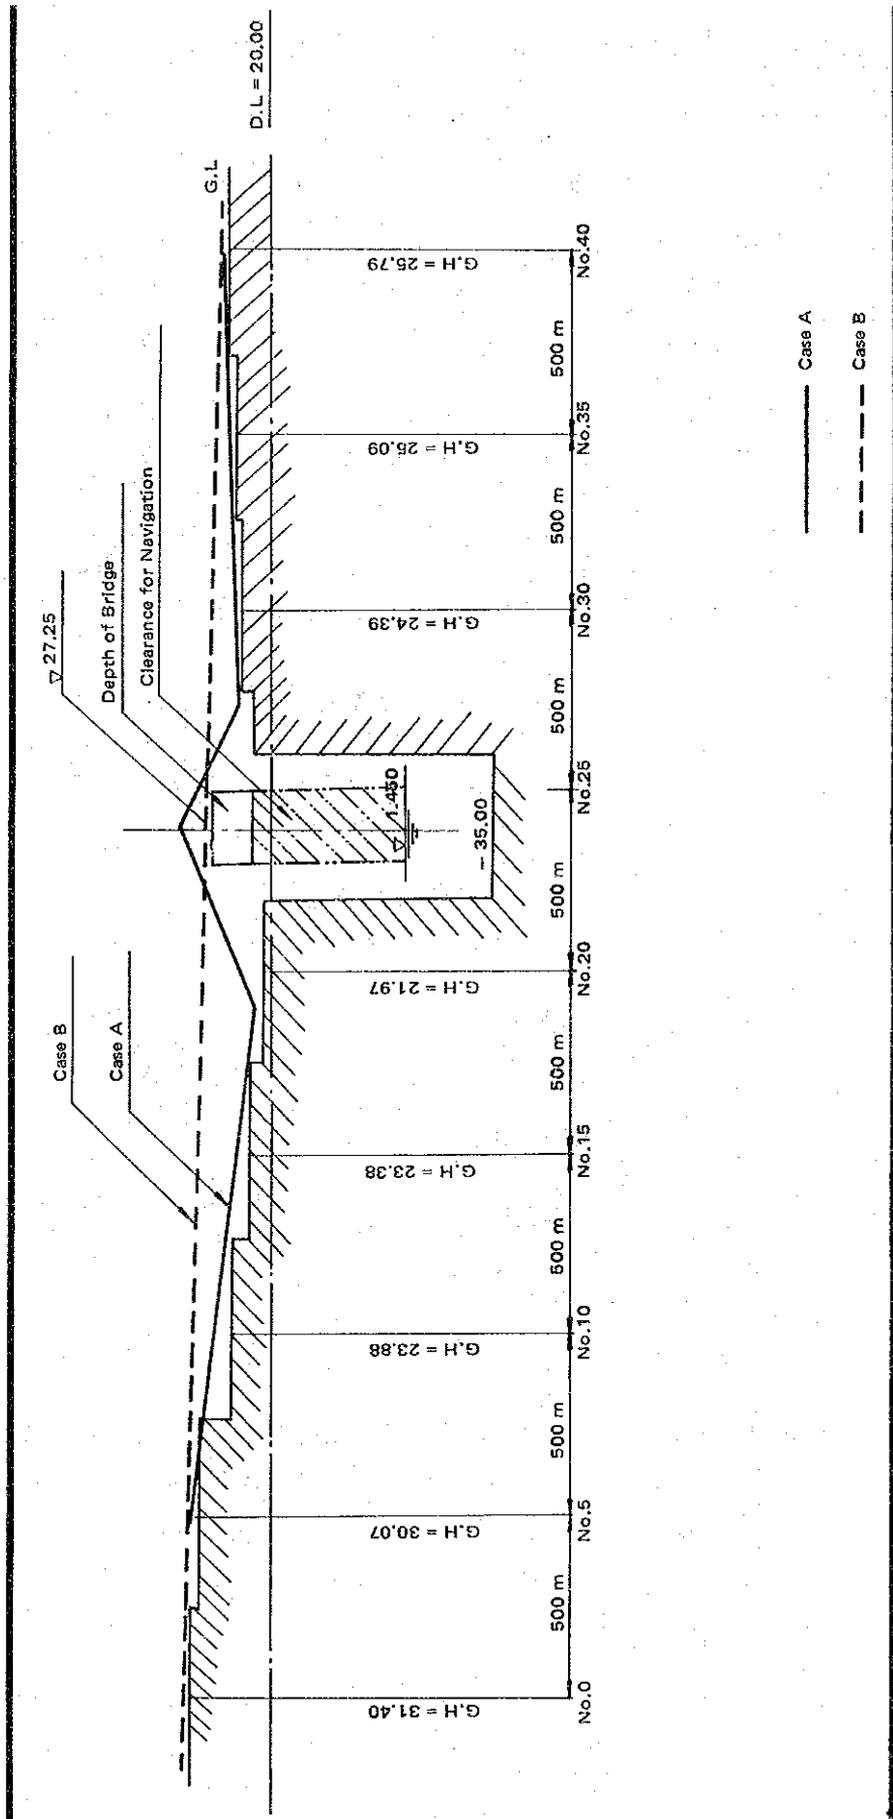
VERTICAL ALIGNMENT PLAN
